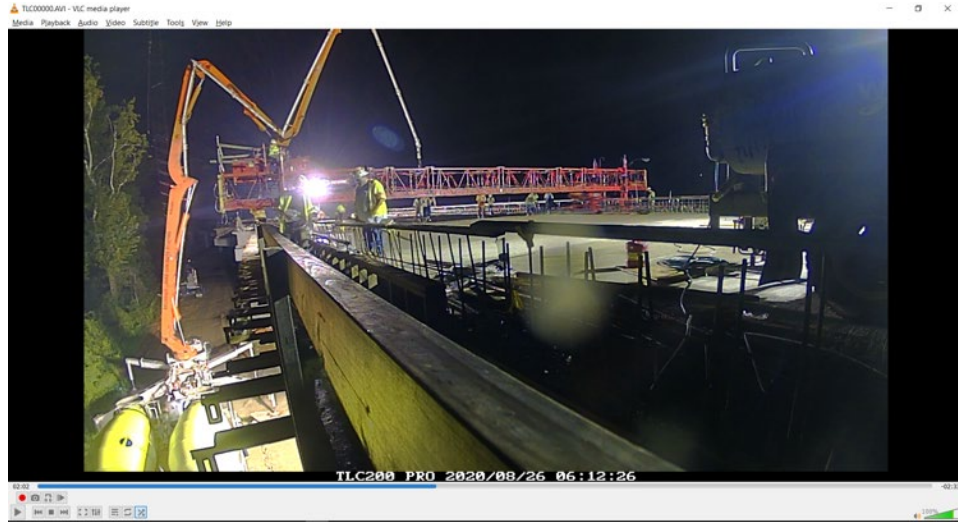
Photo. Identification of the concrete pavement machine as a major construction load from time-lapse camera
